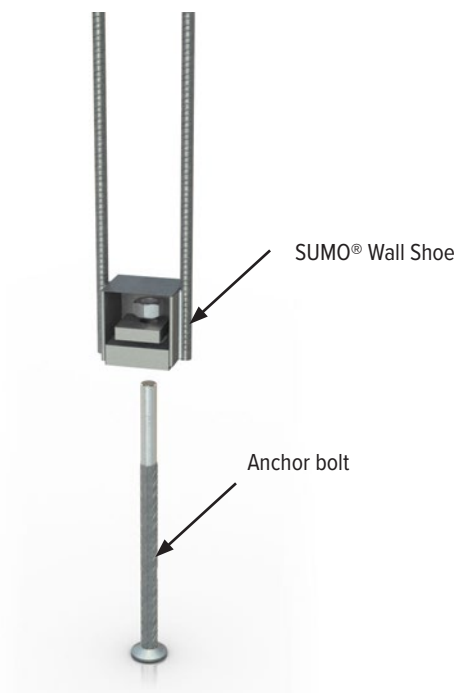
SUMO® WALL SHOE INSTALLED IN PRECAST WALLS
